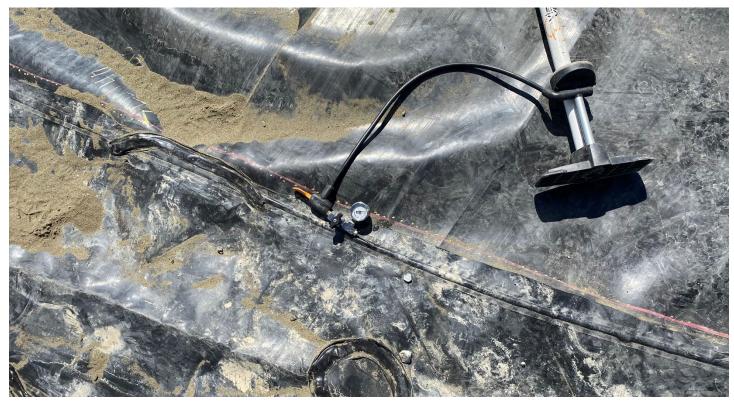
WTL extrusion welding repair on geomembrane on crest of PEA.
